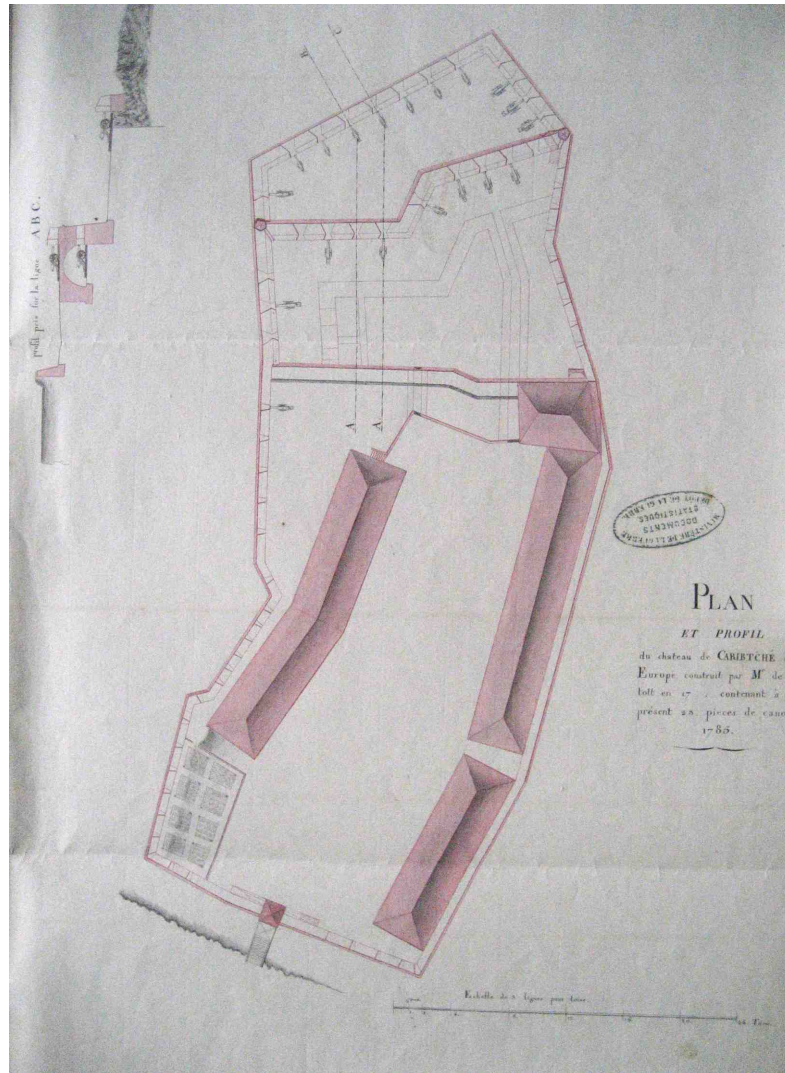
Plan and section drawings of Garipçe fortress from 1785 (SHAT GR1M.1616)
